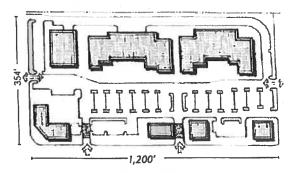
This site plan example depicts an approximate 10 acre site with 42% freestanding "pad" building frontage
